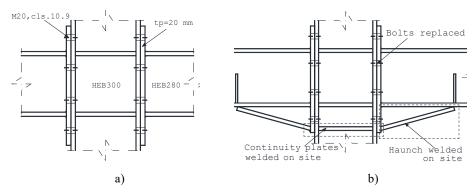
Strengthening/repairing of the beam to column connections: a) actual beam-to-column connection; (b) connection strengthened with additional haunches, continuity plates, and partial length beam stiffeners
